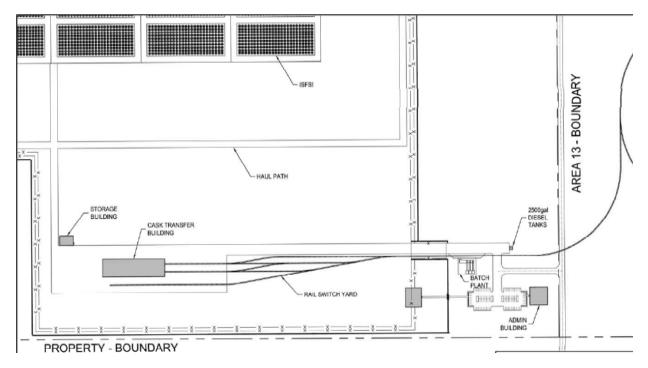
Proposed Project Building Layout (Source: Holtec, 2019a)
